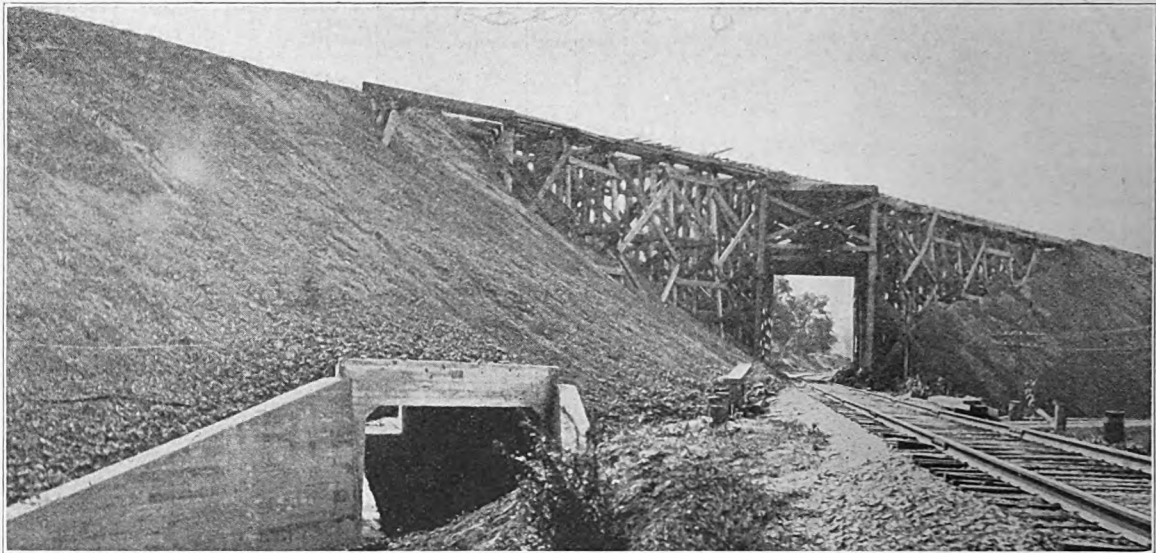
Temporary Trestle for Crossing Over Old Main Line; 15x12-ft. Concrete Culvert for Waterway and for Farmer's Private Use.
